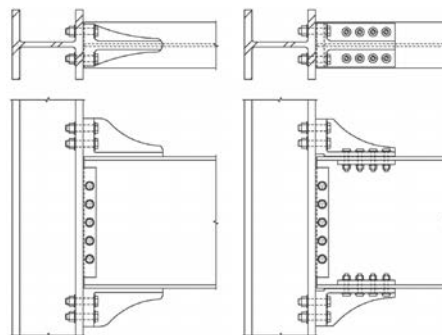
Kaiser Bolted Bracket® Fully Restrained Connection
